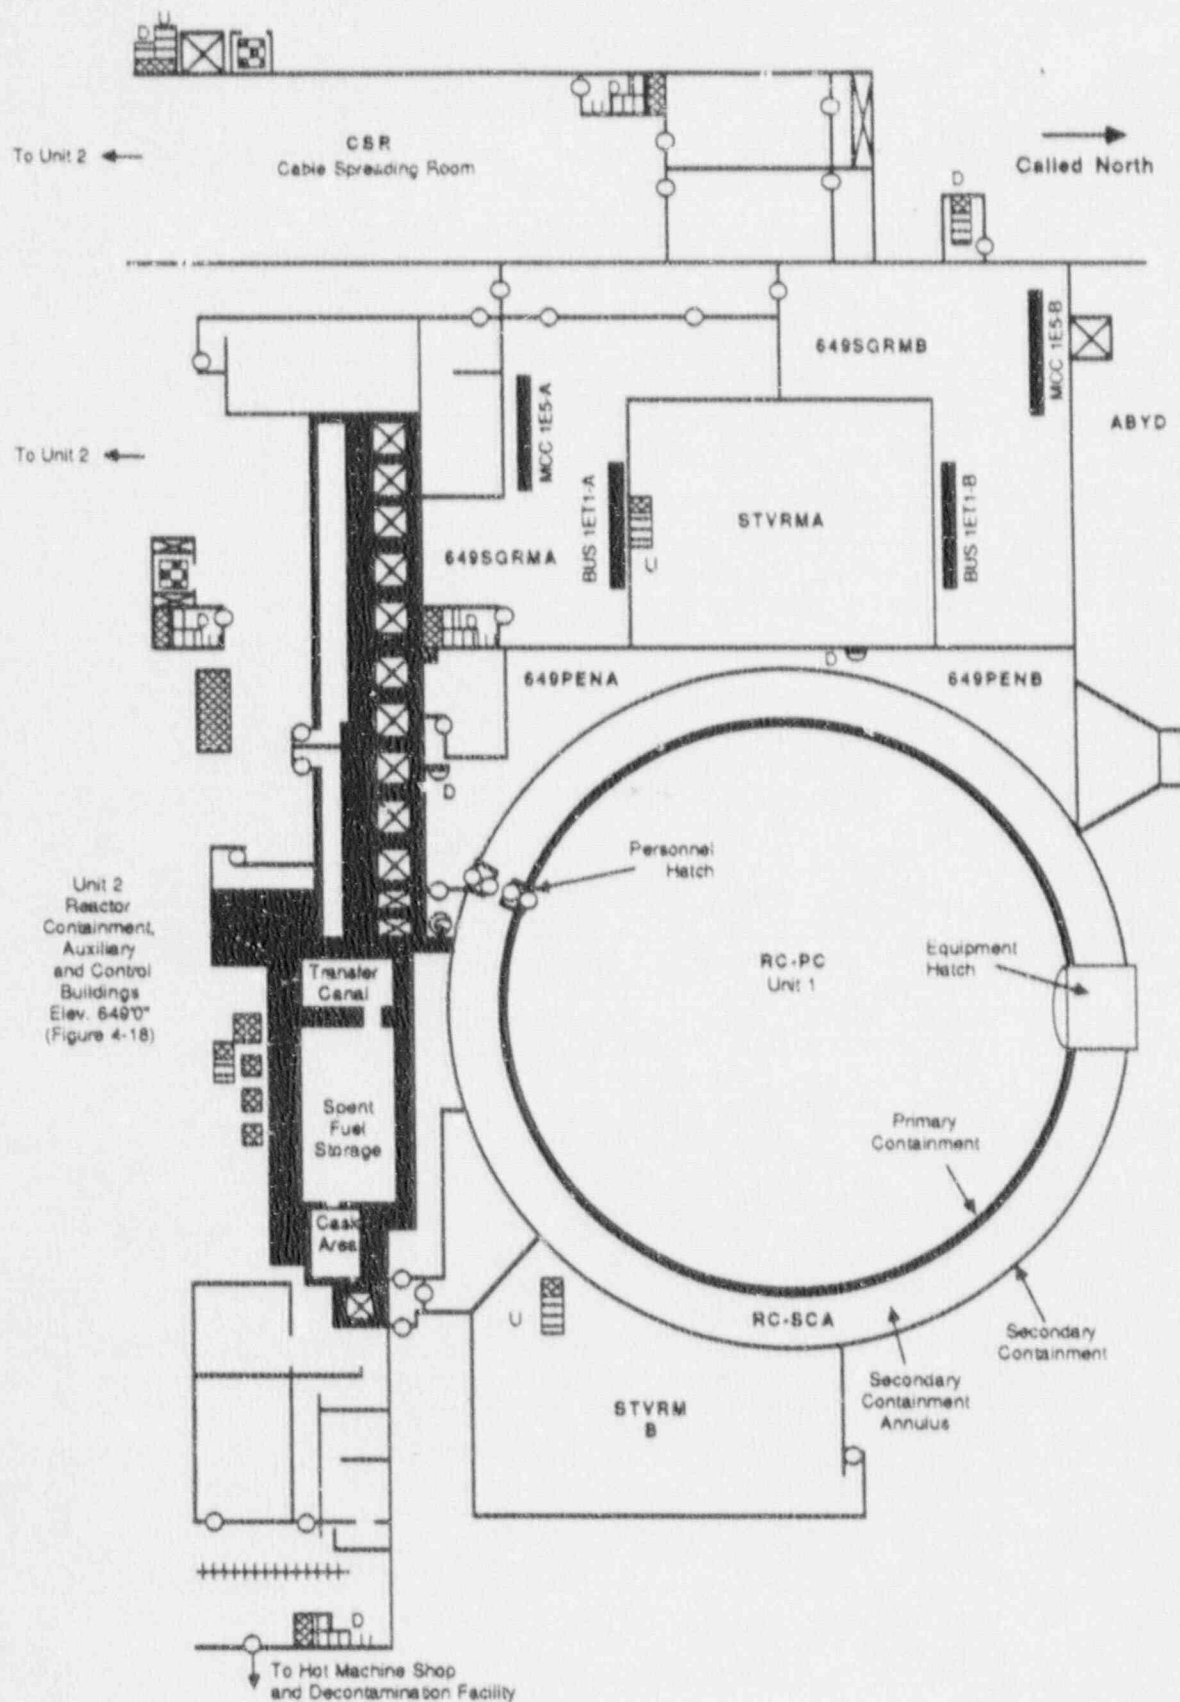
Bellefonte 1 Reactor Containment, Auxiliary and Control Buildings, Elevation 649'0"
